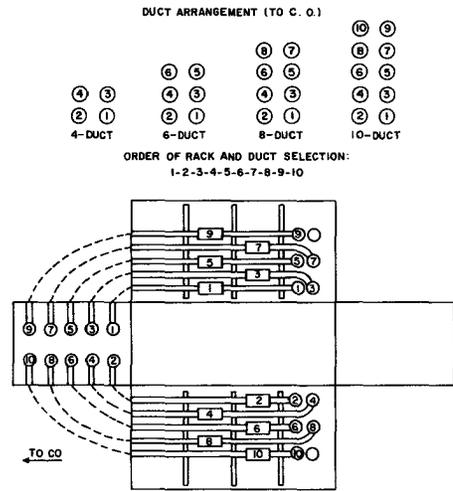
Type T Manhole—5-Foot Wide—10-Duct Capacity—2-Wide Configuration
